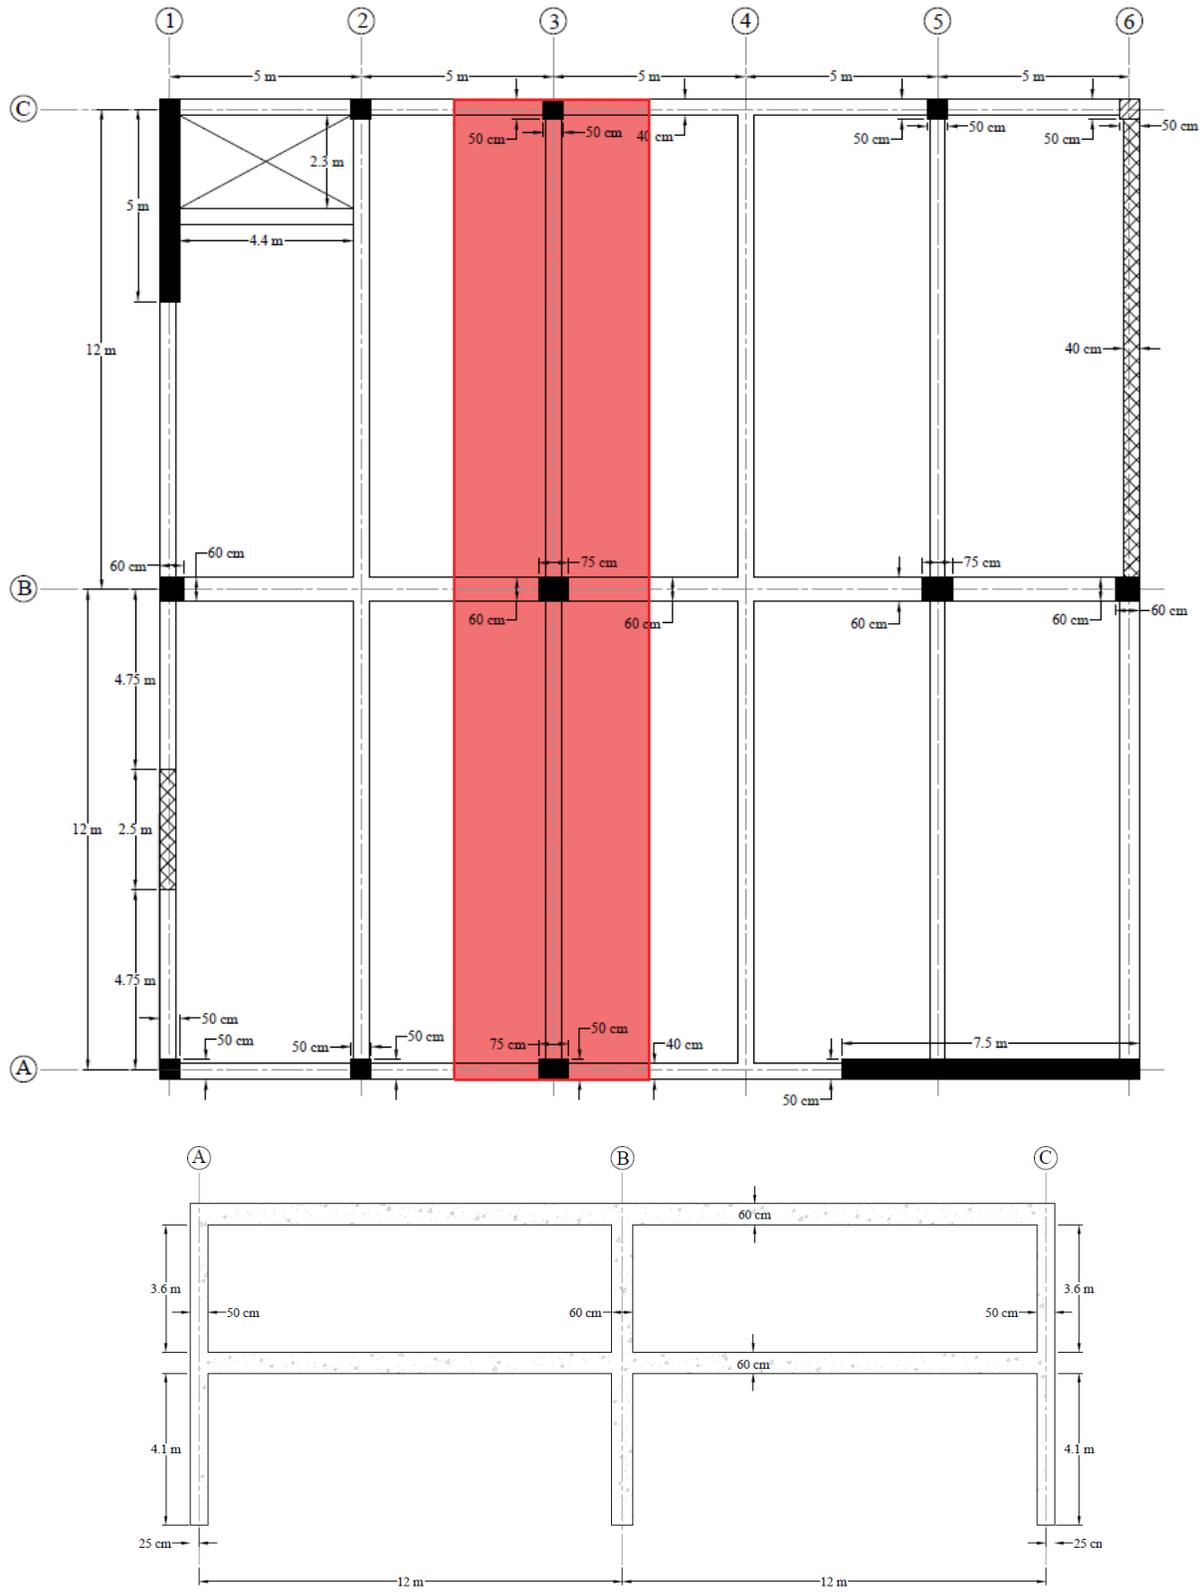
Reinforced Concrete Continuous Beam (Grid 3)
